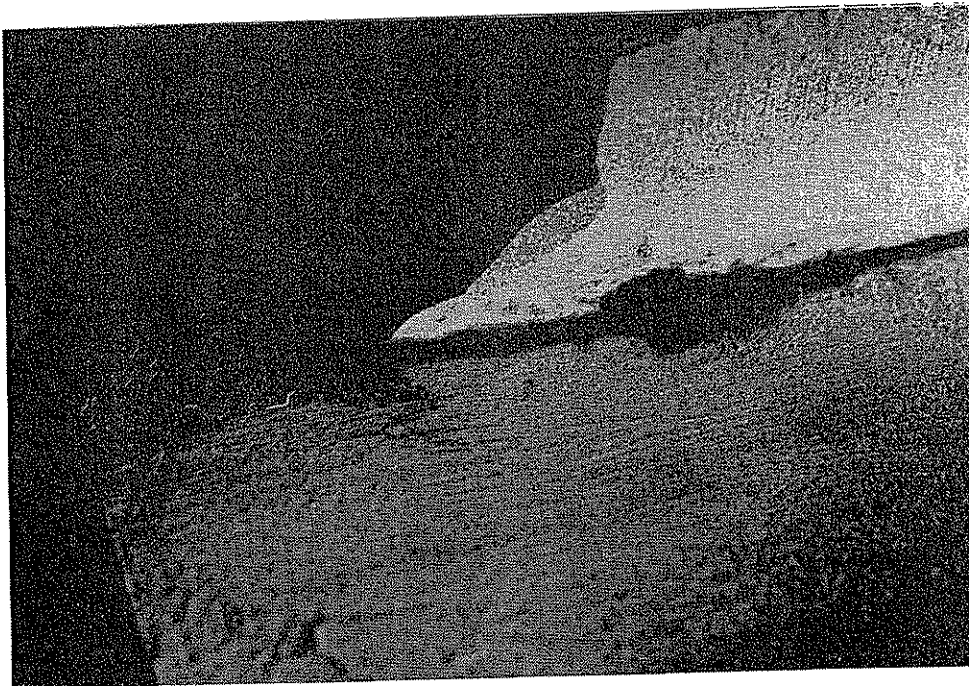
Small crack in girder 2N web after distortion induced stresses.
